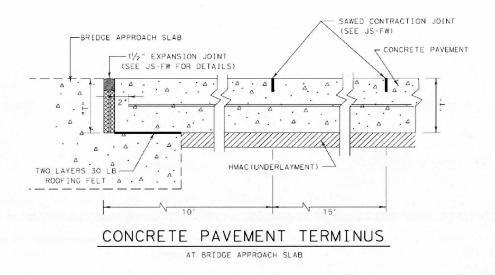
Typical expansion joint system (TxDOT, 2011)
